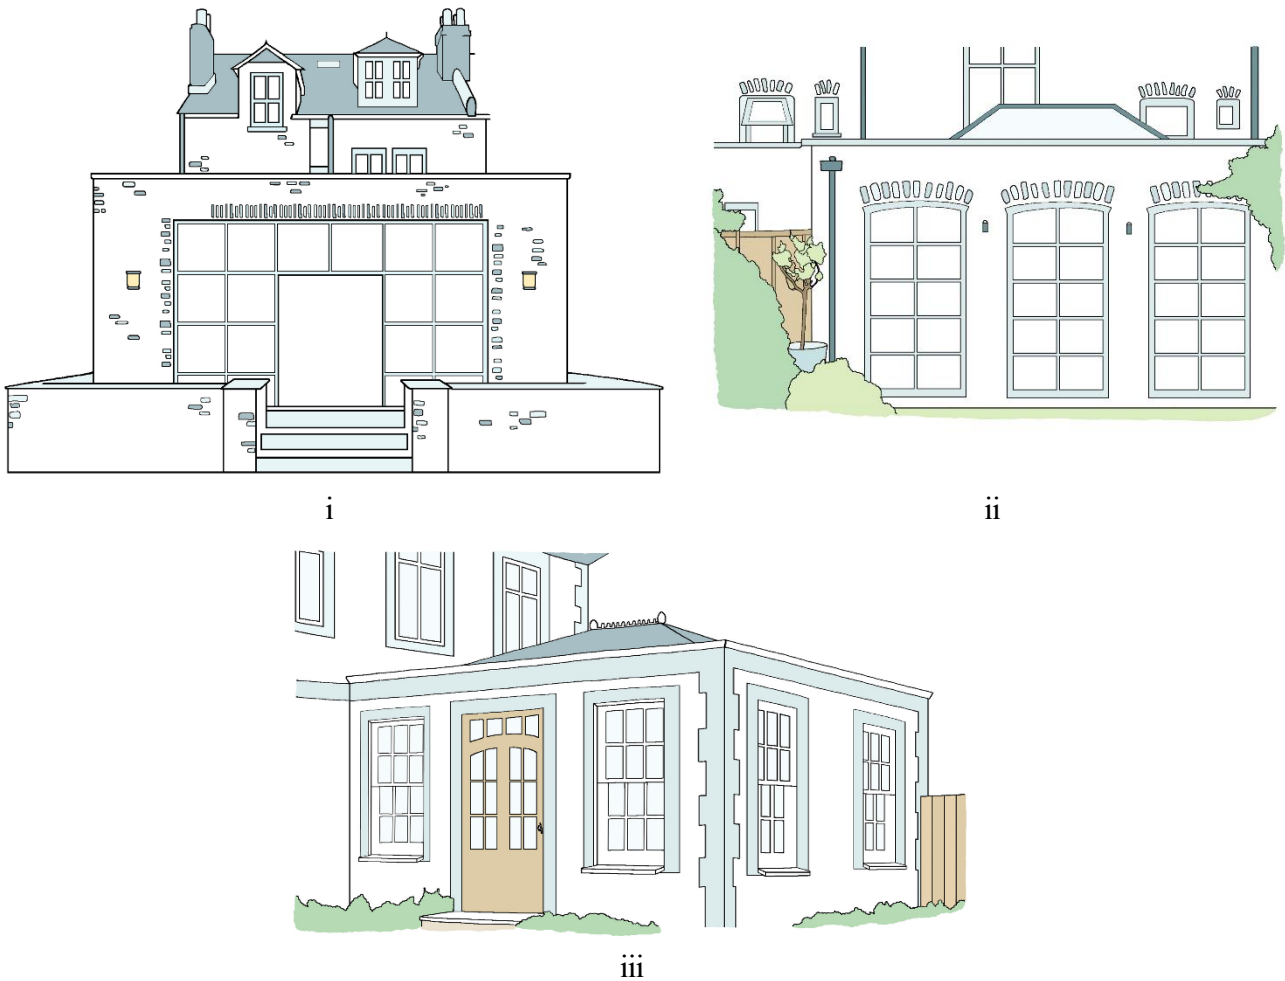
H: Examples of Good Traditional Style Flat Roof Extensions
